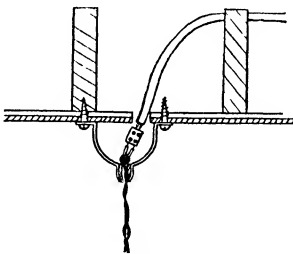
Connection between cable and flexible wire made with a porcelain connector
